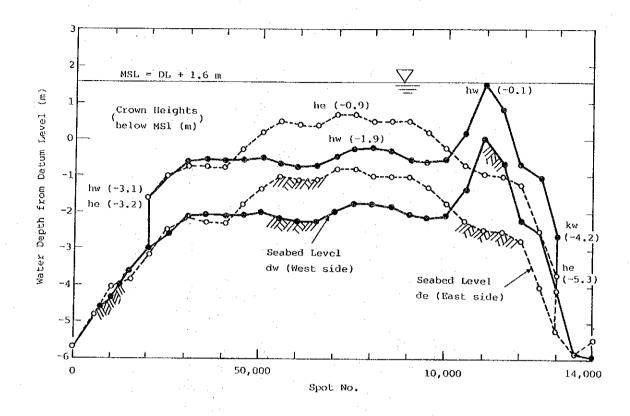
Longitudinal Distribution of Water Depth and Crown Height of Submerged Walls
